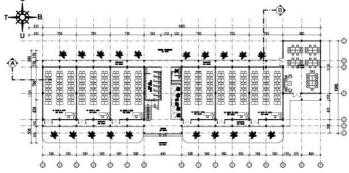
Plan of the Automotive Engineering Main Building 1st Floor
